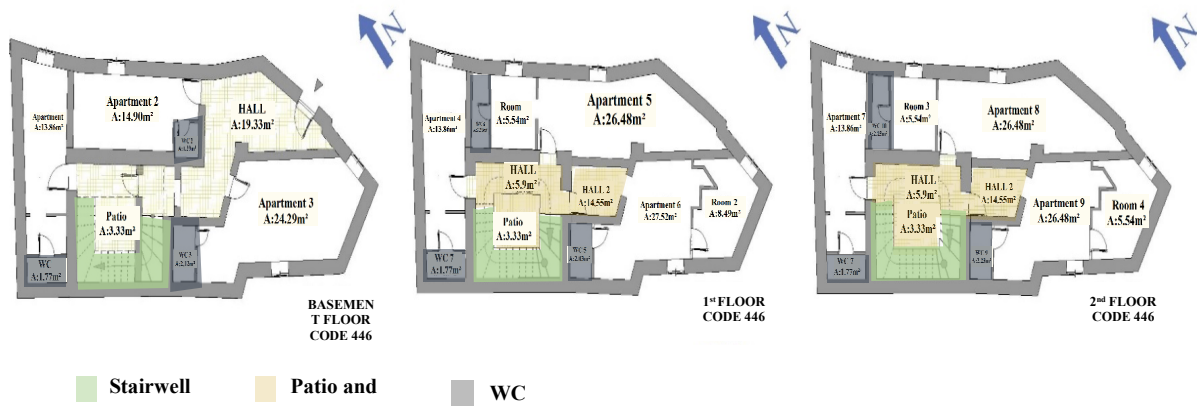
Ground floor plan, 1st and 2nd floor code 446.
